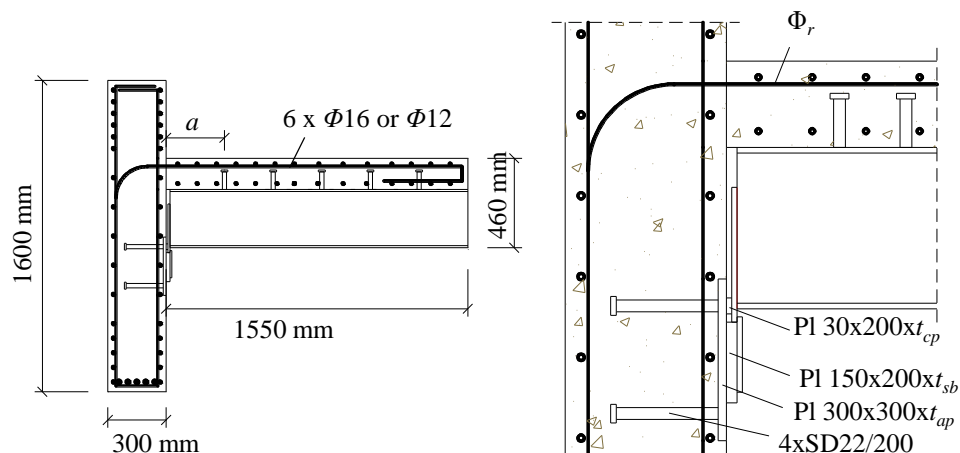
a) Test specimen's general configuration; b) Joint detail
